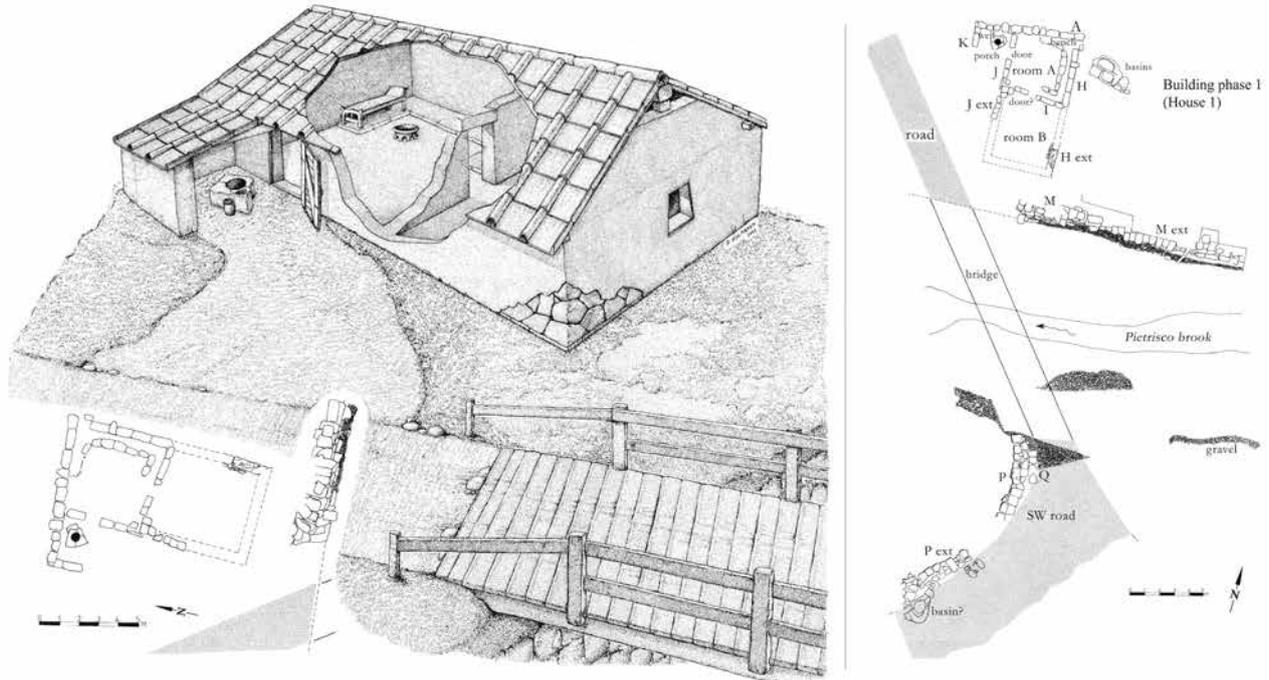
Phase 1 of the Bridge Complex (before the earthquake of 550/530 BC) showing (left) a reconstruction of House 1 (northern abutment) adjacent to the bridge with plan of House 1, and (right) plan with House 1 and both the northern and southern bridge abutments (reconstructions after Backe Forsberg 2005 by Y. Backe Forsberg and with illustrations by R. Holmgren).
